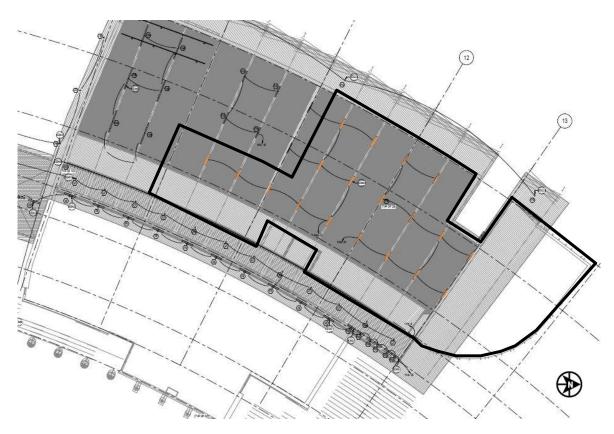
| Museum [Upper] Reflected Ceiling Plan
